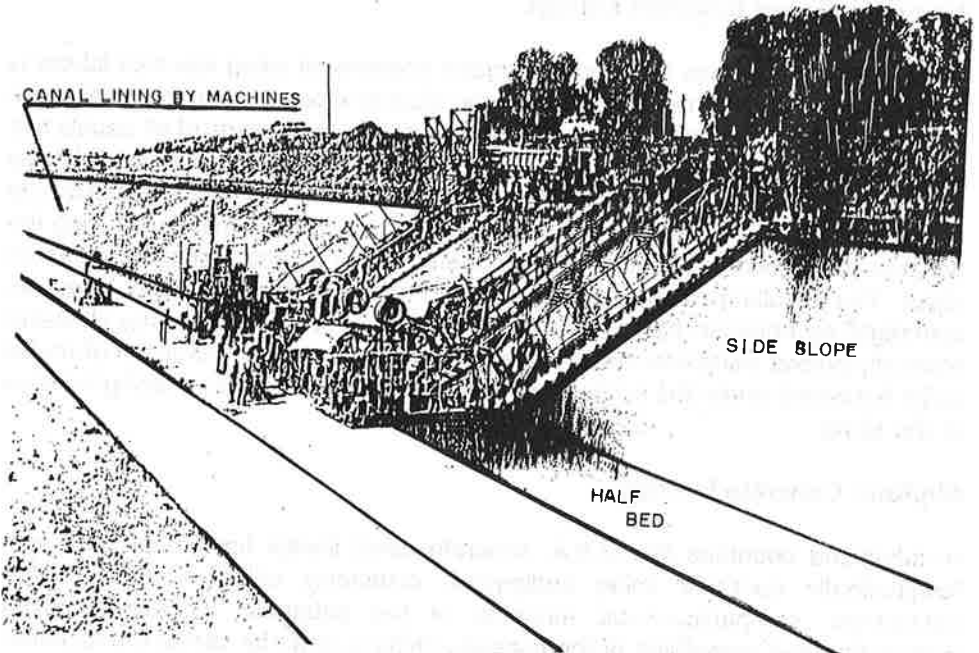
A Photograph Showing Half Section Canal Construction by Lining Machines.
